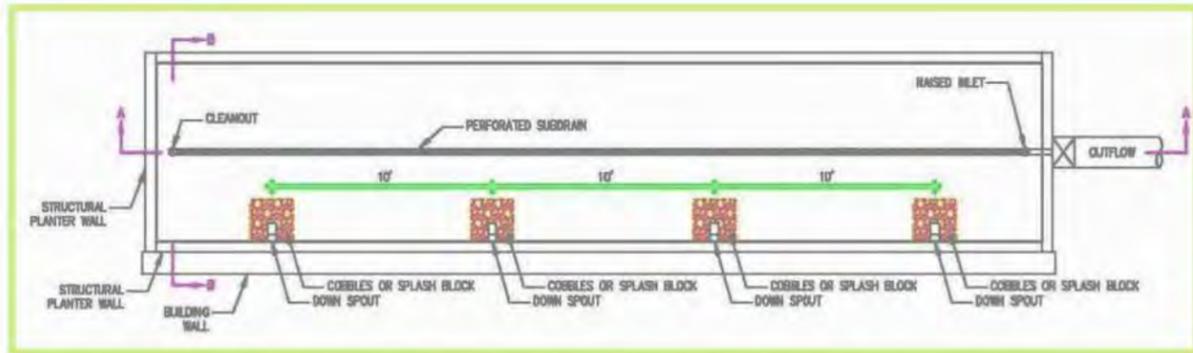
Plan view of long, linear planter, with inlets to the planter distributed along its length at 10' intervals.
